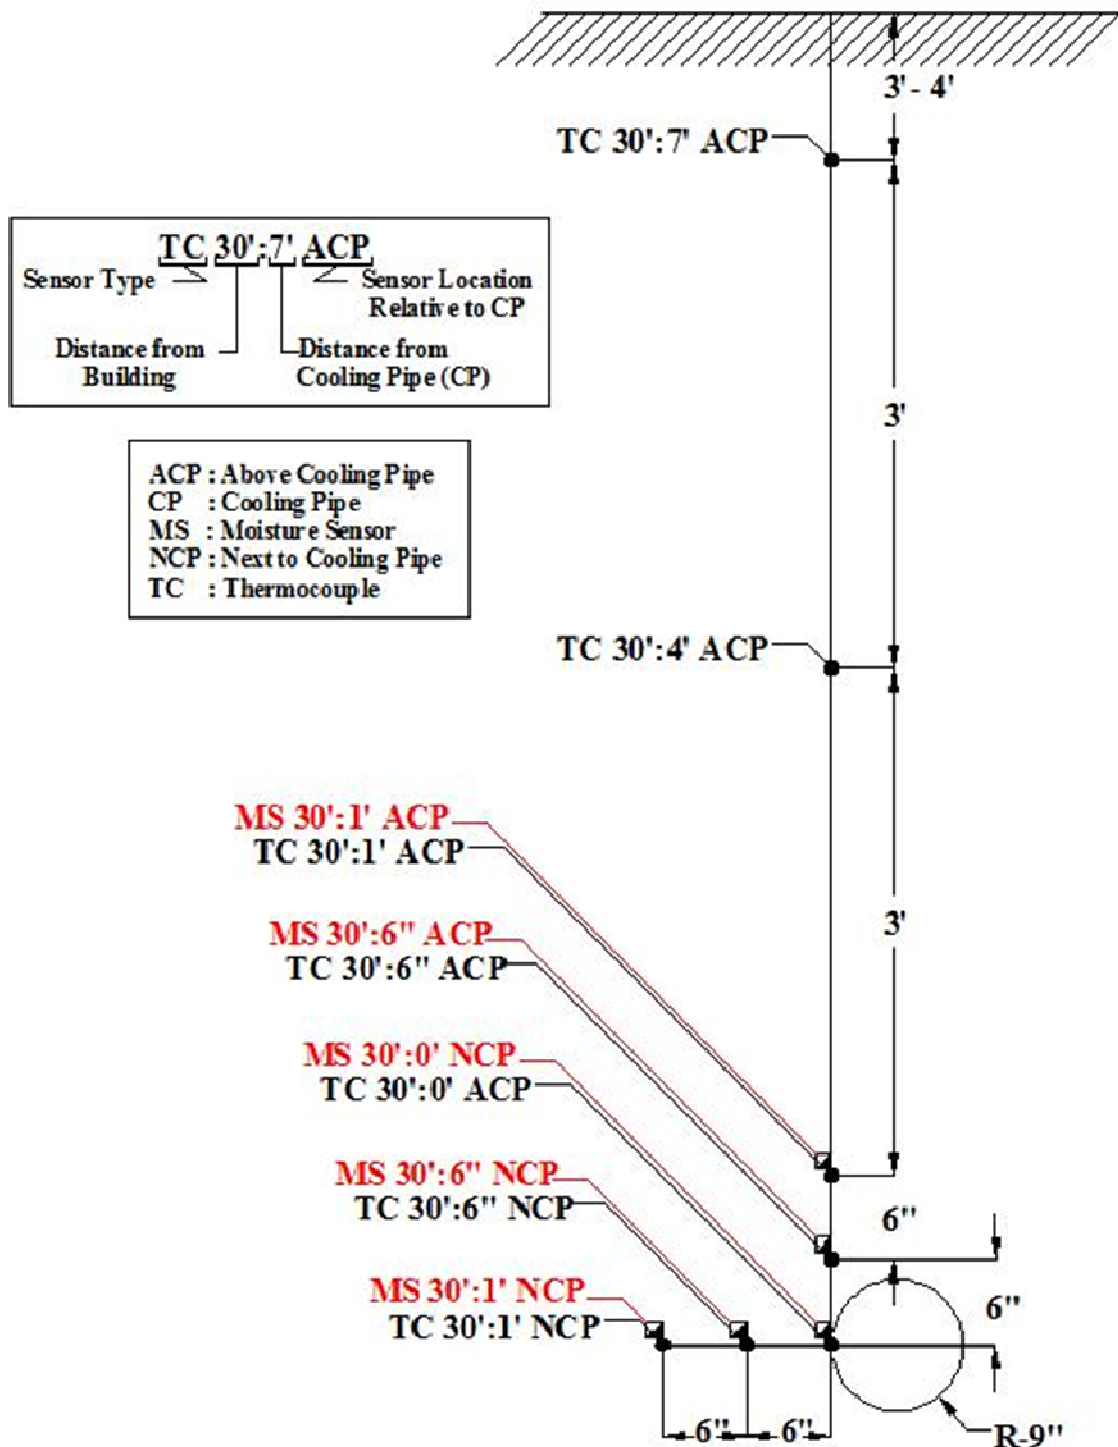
EAHE cross section at 30' sensors location – 2009 testing
